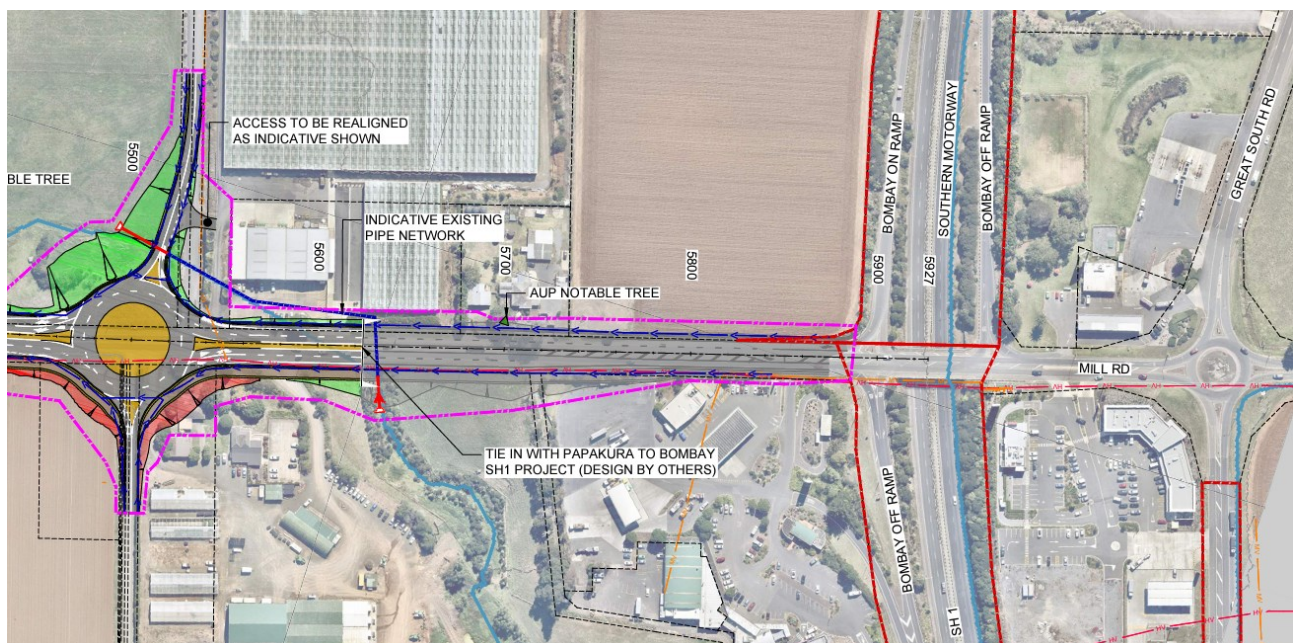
Layout plan Pukekohe: Mill Road and Pukekohe East Road Upgrade (NZTA)
